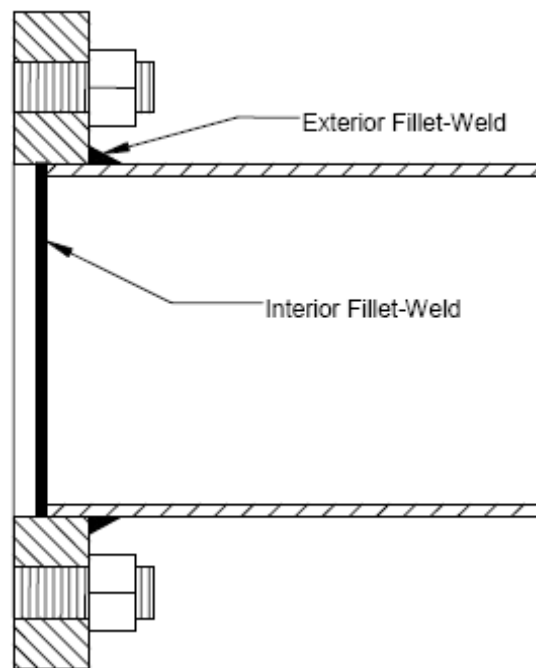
Fillet Welded Socket Connection detail
